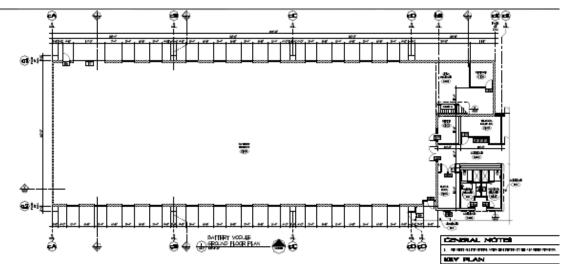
Floor Plan for the High Energy Battery Test Facility.
